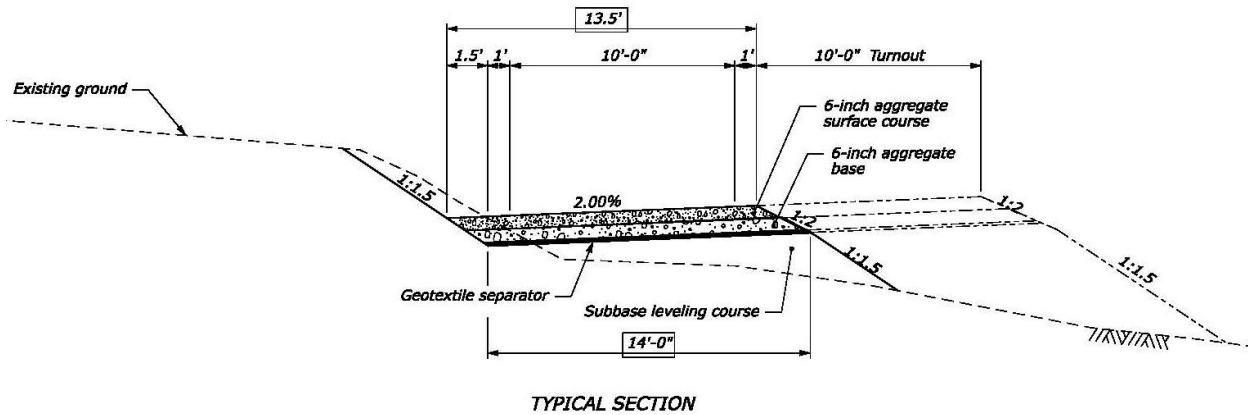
13.5-Foot Roadway Template, Without Ditch
